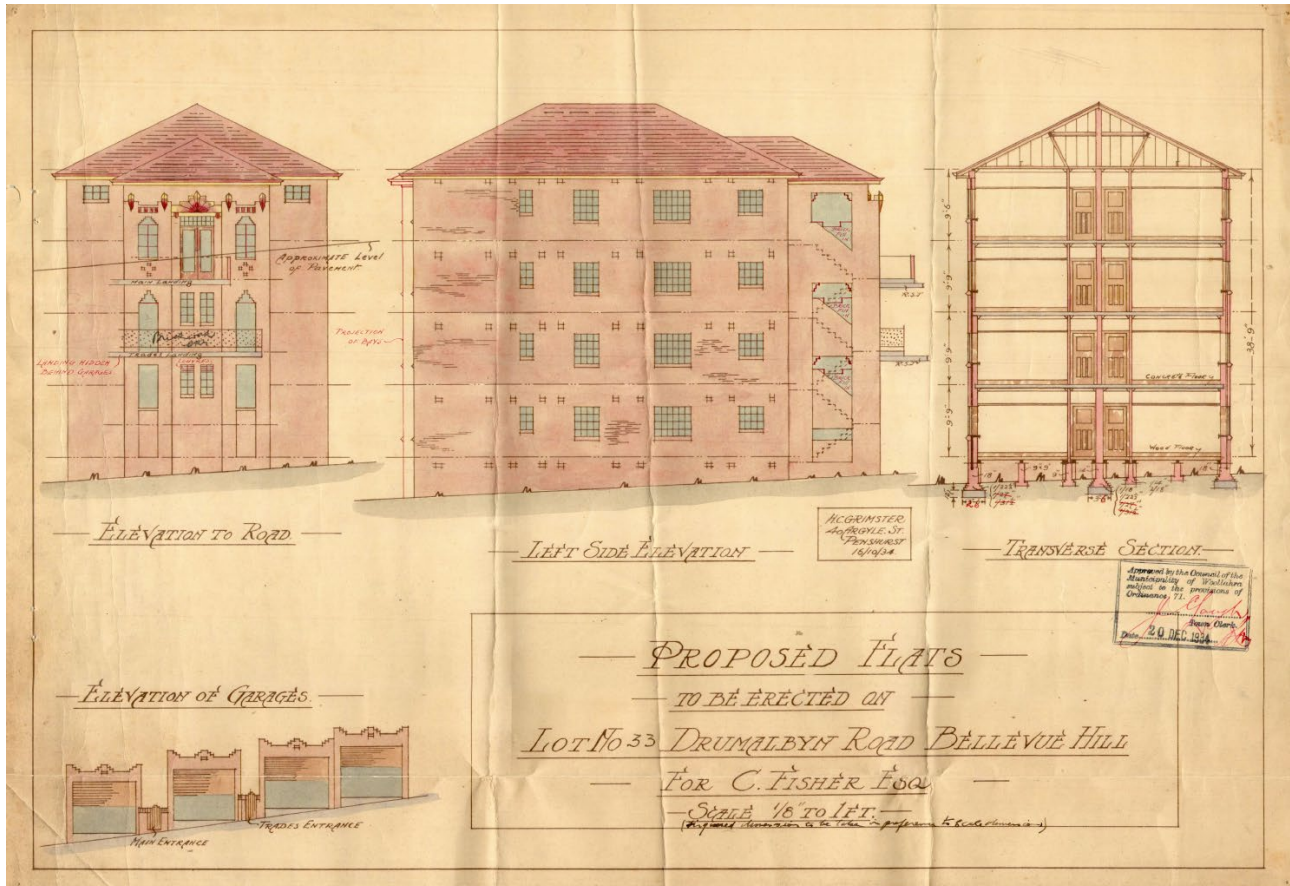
Original drawings for 84 Drumalbyn Road by H C Grimster. The facade as built is quite different, and the garages were constructed without detail.
